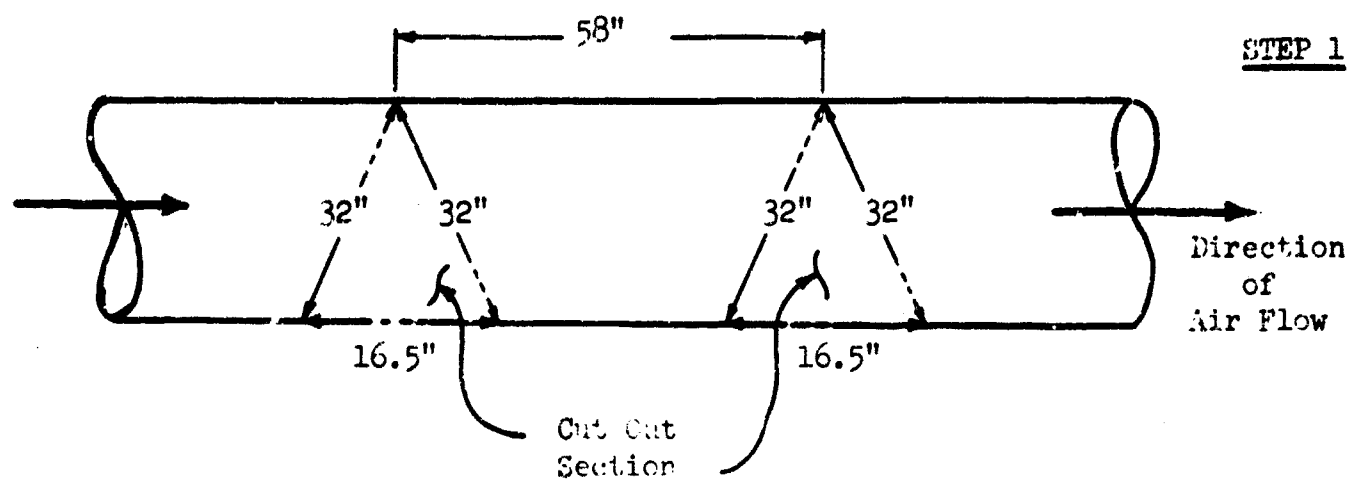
SHELTER FABRICATION OF A 60-INCH RADIUS, 90-DEGREE, THREE-PIECE ELBOW
